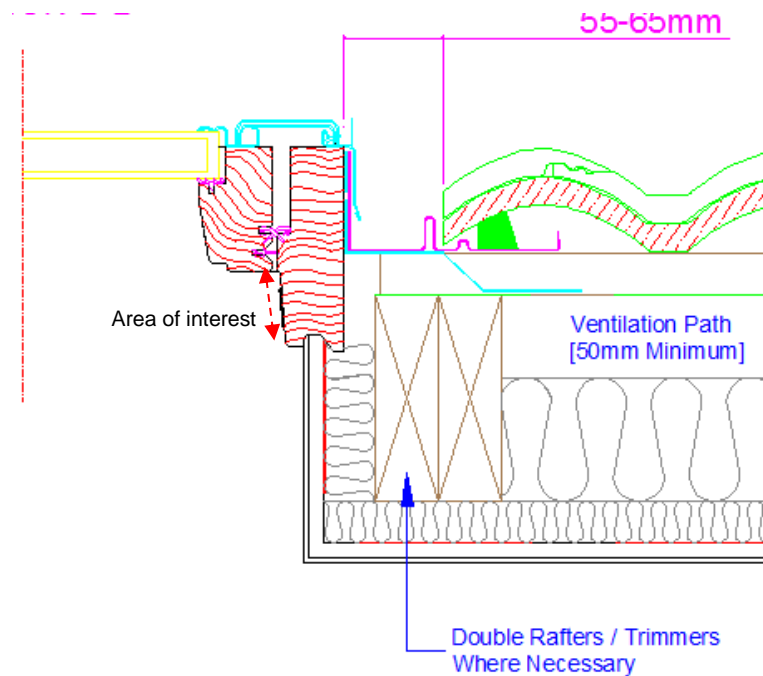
Right hand side of roof window/jamb detail without Keylite Thermal Collar. Area of interest indicated by dashed red arrows.
